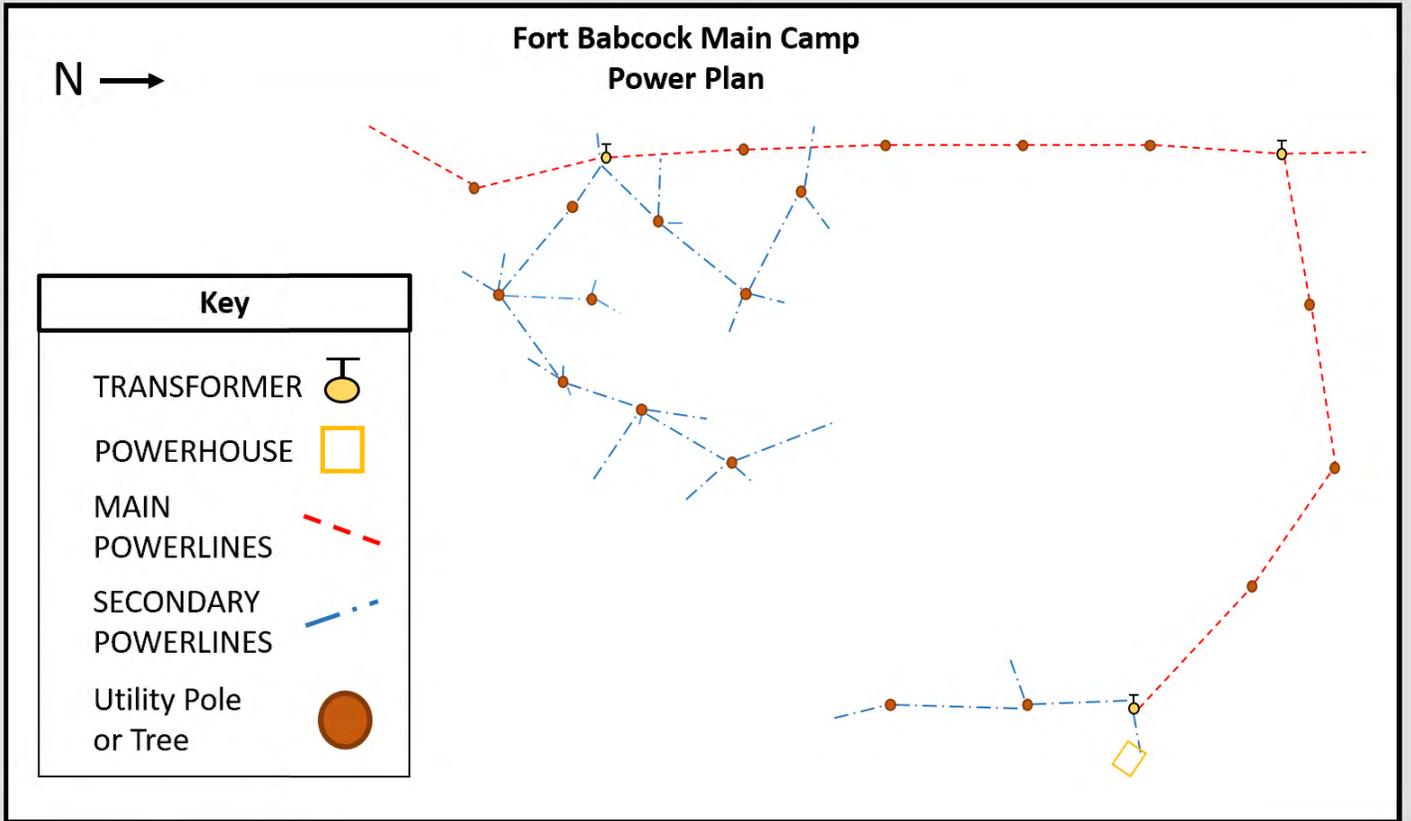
Fort Babcock Main Camp power plan (after 1944 Power Plan).
